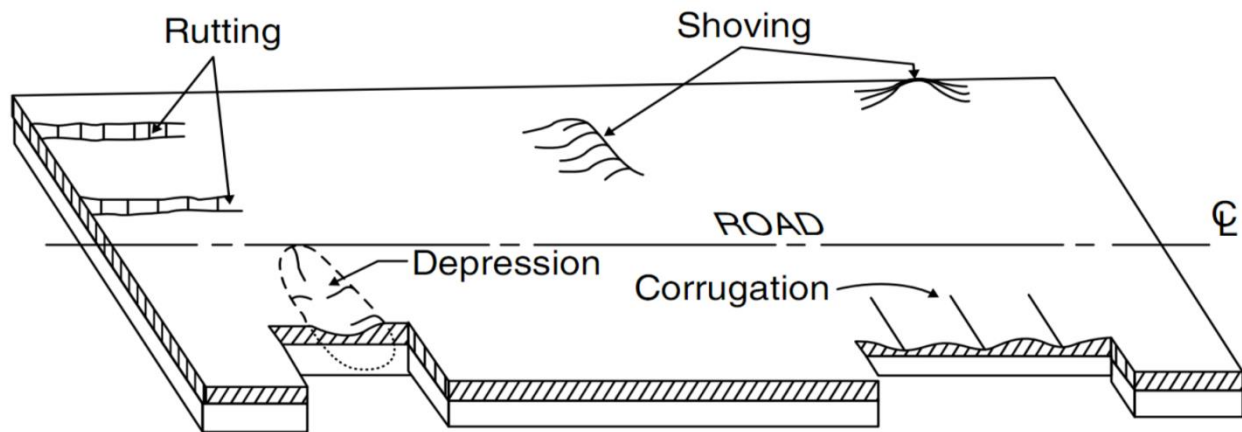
Sketch of deformations in flexible pavements (Source: Austroads, 1991).
